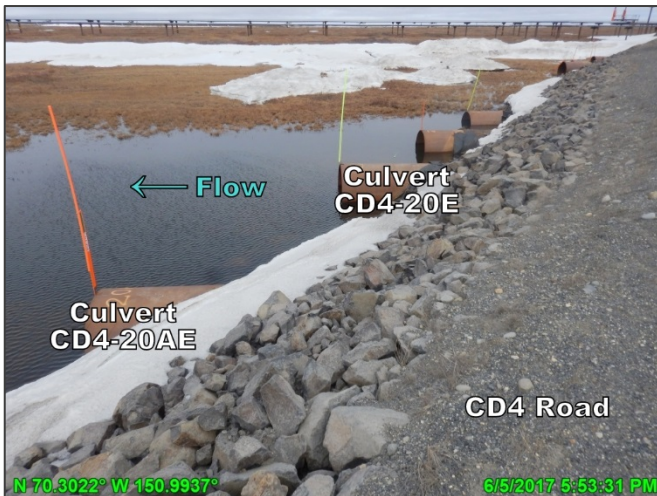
East side of CD4 road south of CD5 road, looking southeast; June 5, 2017
